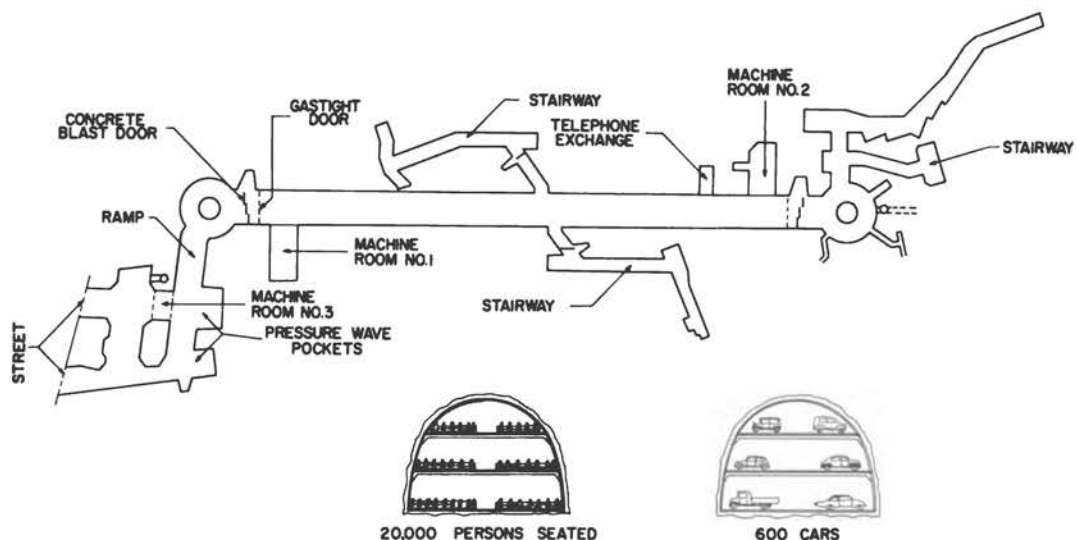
Diagrammatic sketch showing plan of a 20,000-person shelter in Stockholm
